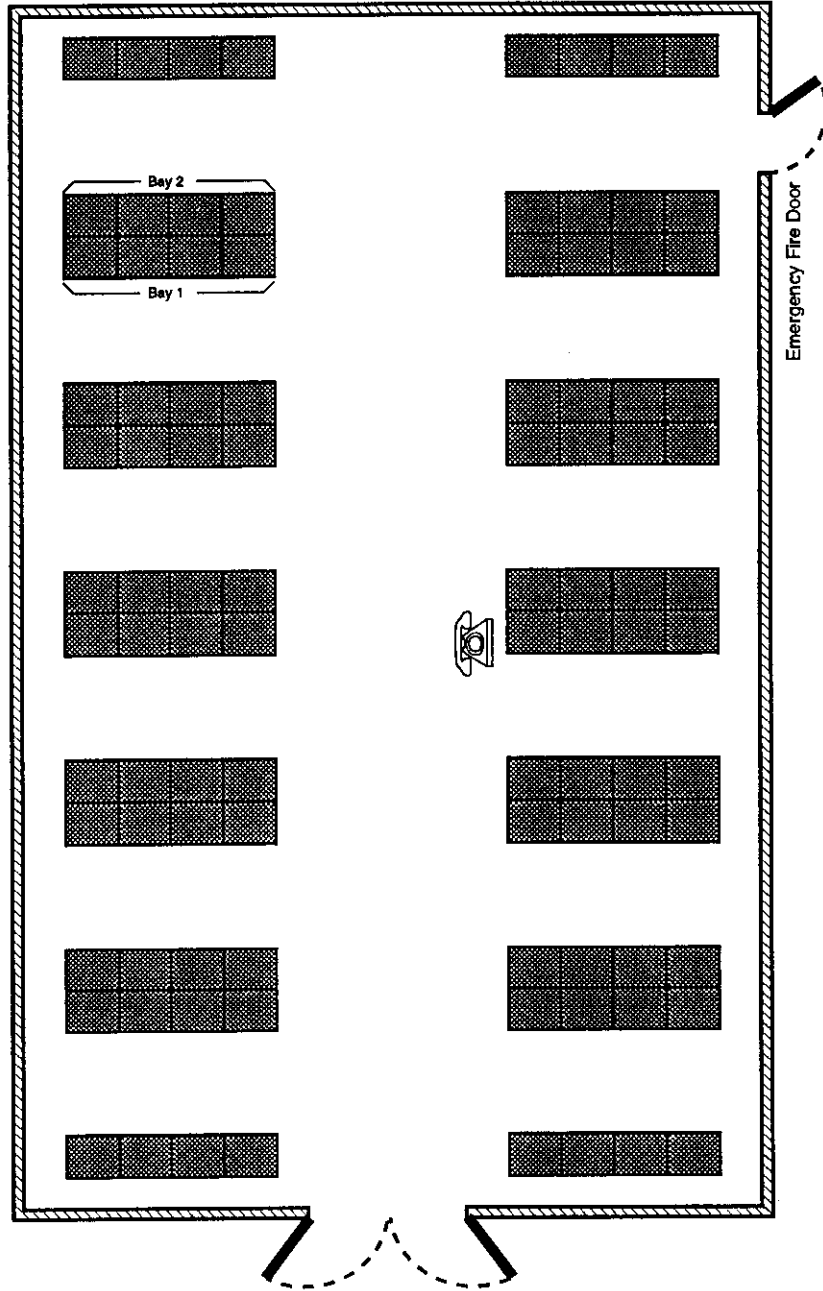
Typical Relay Room Layout in a Centralised Configuration
